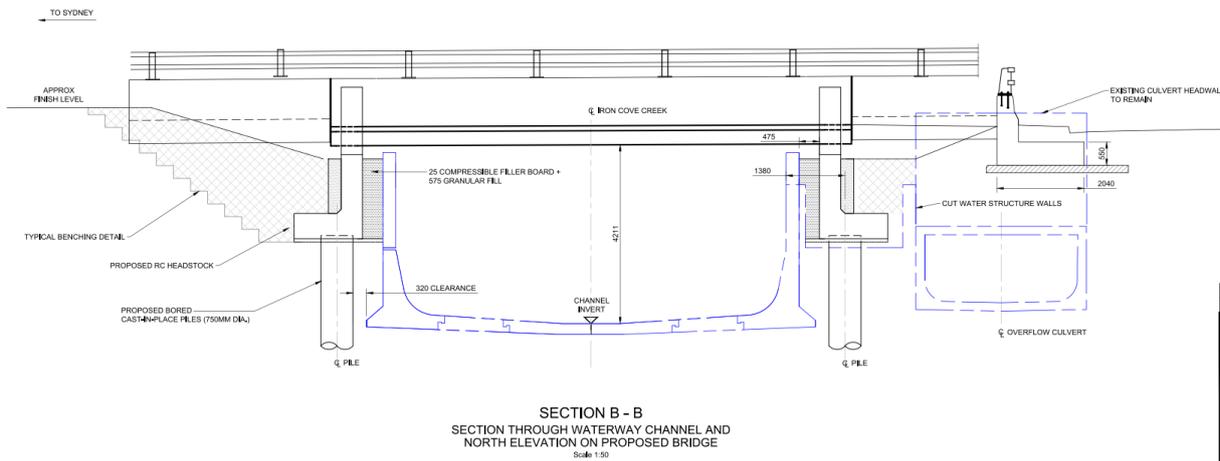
Section view looking south at the proposed northern extent of the extended overbridge, showing pile locations to east and west of existing canal, new wing walls to the east and west of existing canal fabric, and box culvert to the right of figure.
